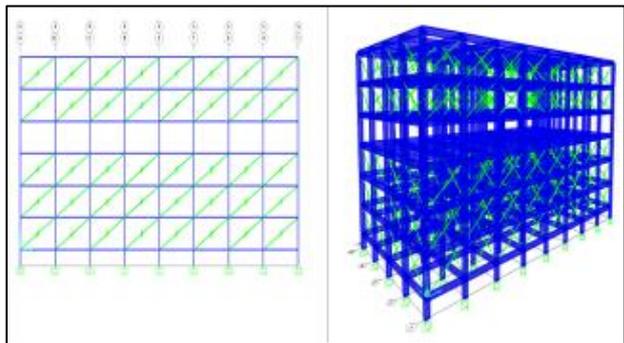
Elevation & 3D View of G+5 soft storey at third floor.
